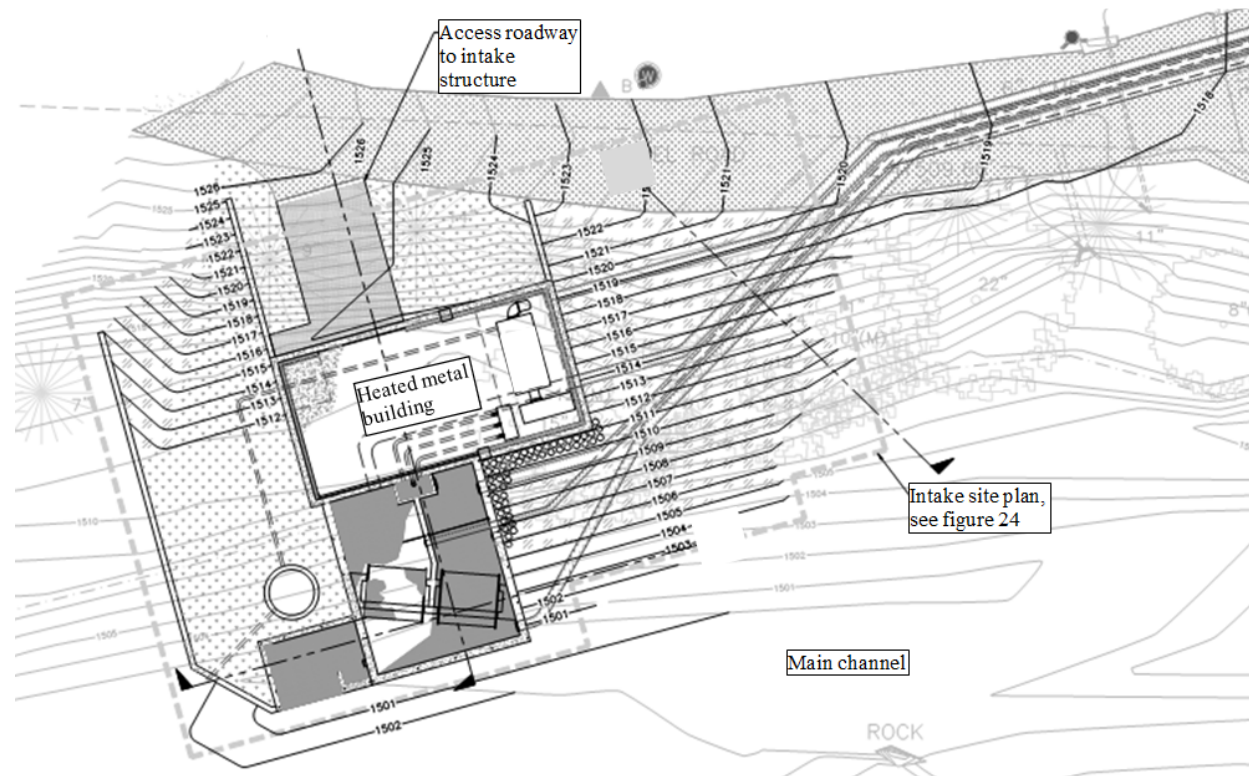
Concept 3 intake site plan at proposed new intake (Bennett, C. and Kingsley, S., 2013).
